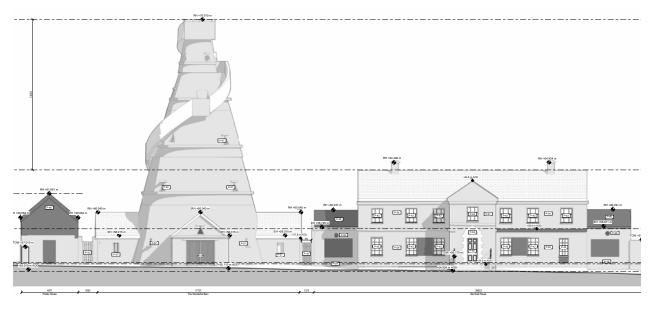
Proposed Elevation 01 by Metropolitan Workshop
